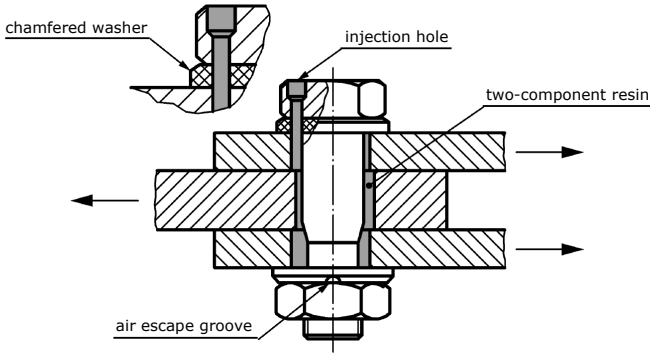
Injection bolt in a double shear connection according to EN 1090-2, Annex J
